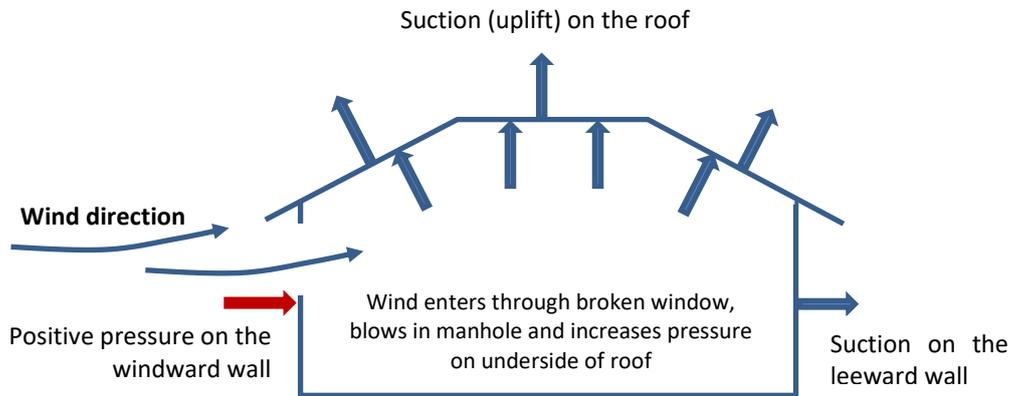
Typical internal pressures on a building with an opening on a windward wall
